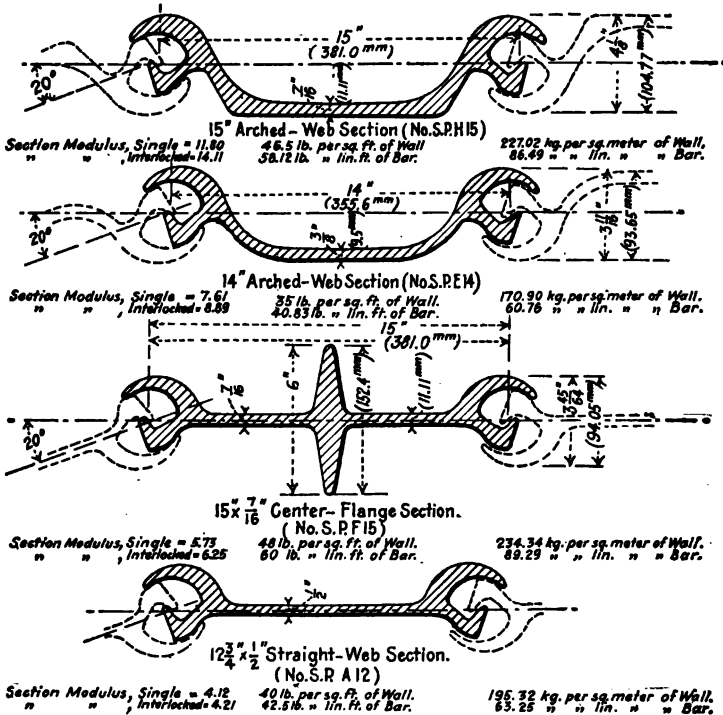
Sections of Lackawanna Steel Sheet Piling.
